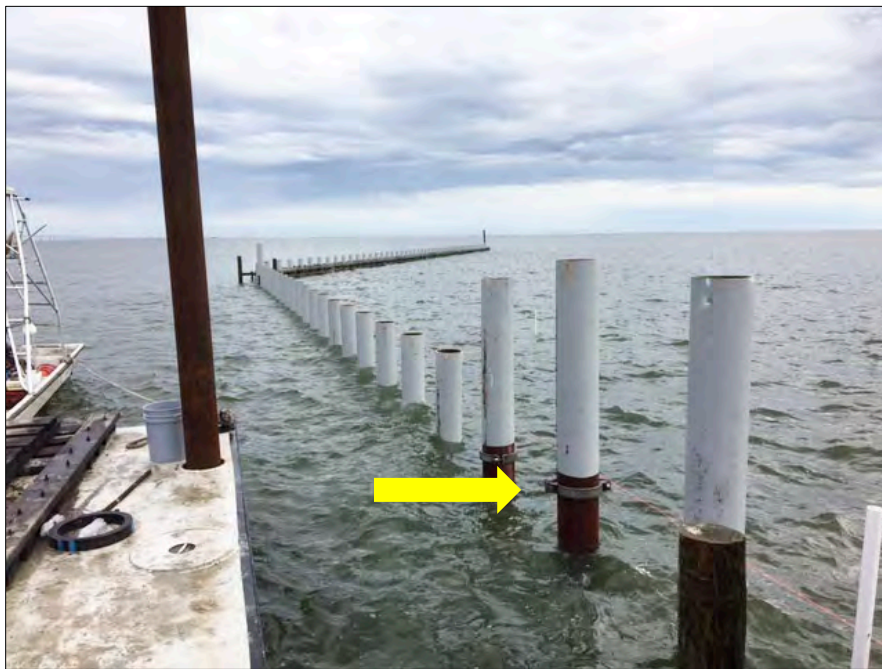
East-facing view of installation of the central pilings with piling clamps at the Bonner Bridge Seagrass Mitigation Site. Yellow arrow points to an installed clamp.
